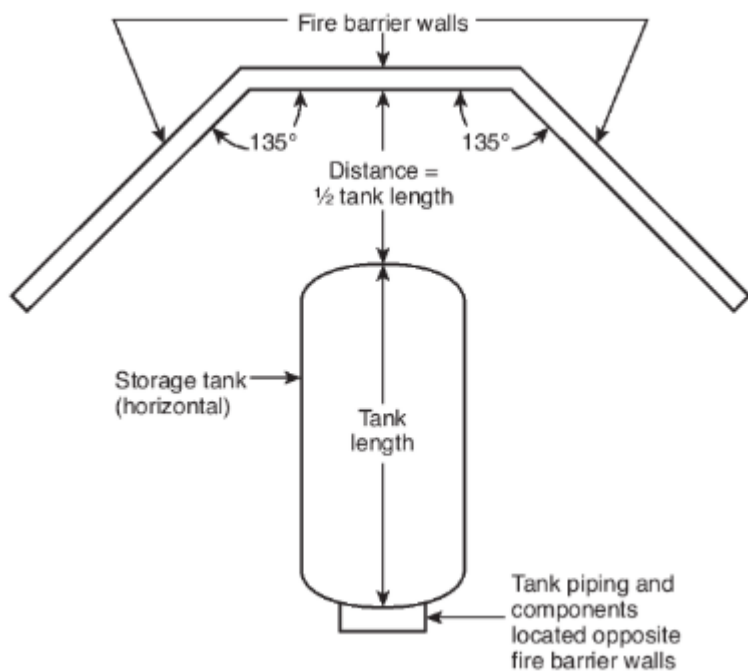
Schematic of three-sided fire barrier wall enclosure for horizontal hydrogen storage
